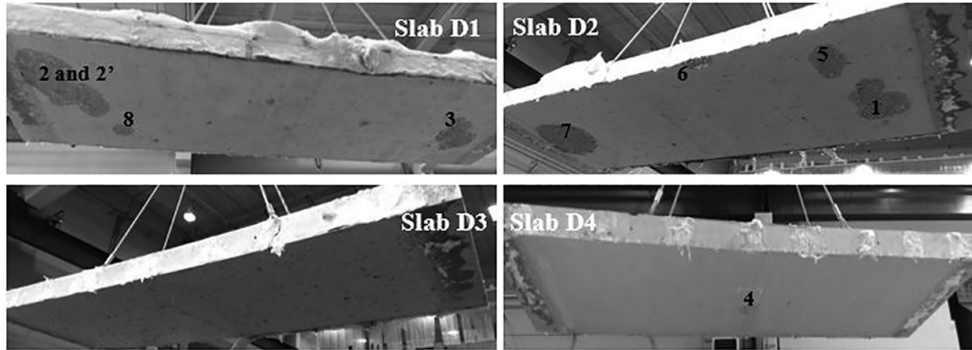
Slabs after ISO 834-1 [66] fire test: D1 and D2 are concrete with RCA; D3 and D4 are concrete with NA (adapted from Robert et al.[70])
